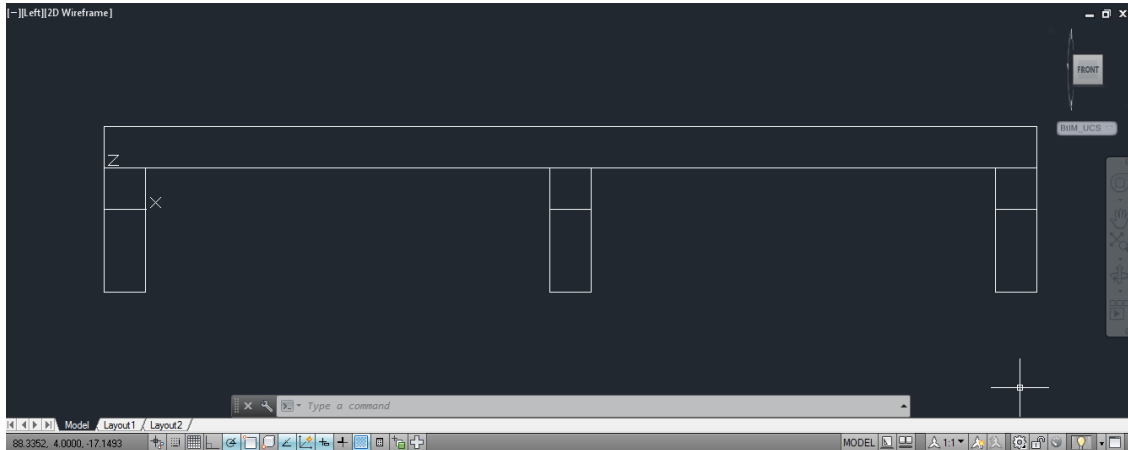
2D Wireframe Profile of a Beam/Girder Bridge
